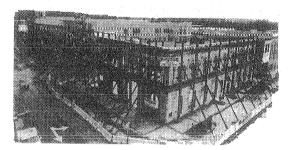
Historic Building Façade preserved (Source: The City of Santa Cruz)
